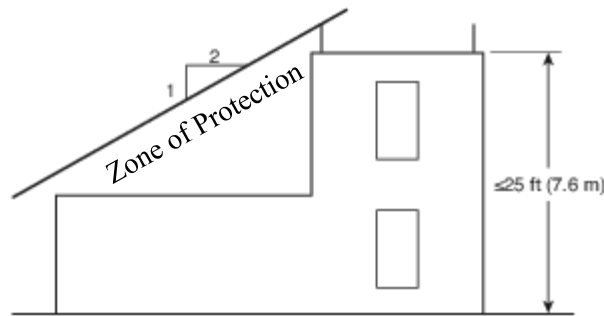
Lower Roof Protection for Flat-Roof Buildings 25 ft or Less in Height
